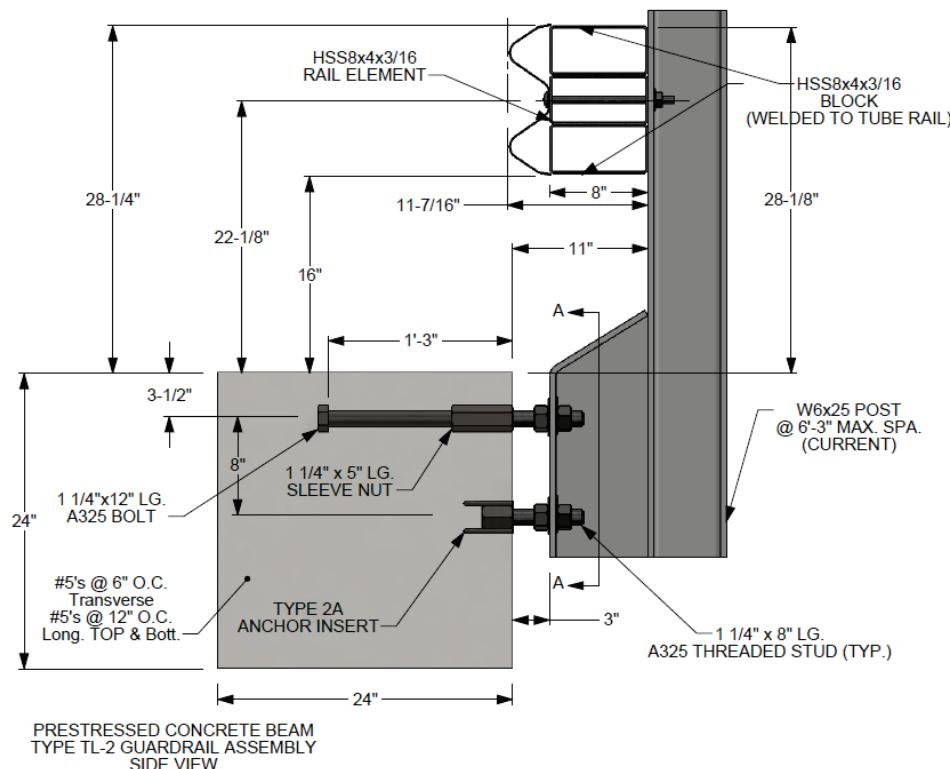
West Virginia DOT Pre-stressed Concrete Beam TL-2 Guardrail (6 ft-3 inch Post Spacing) at 28 $\frac{3}{8}$ -inch Height
